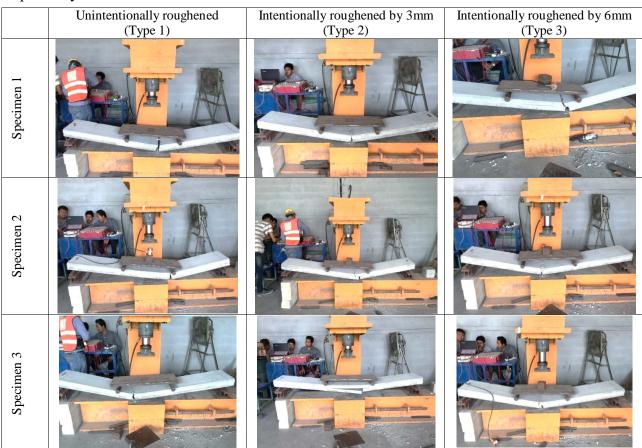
Characteristics of the concrete slab composites at their points of failure.
